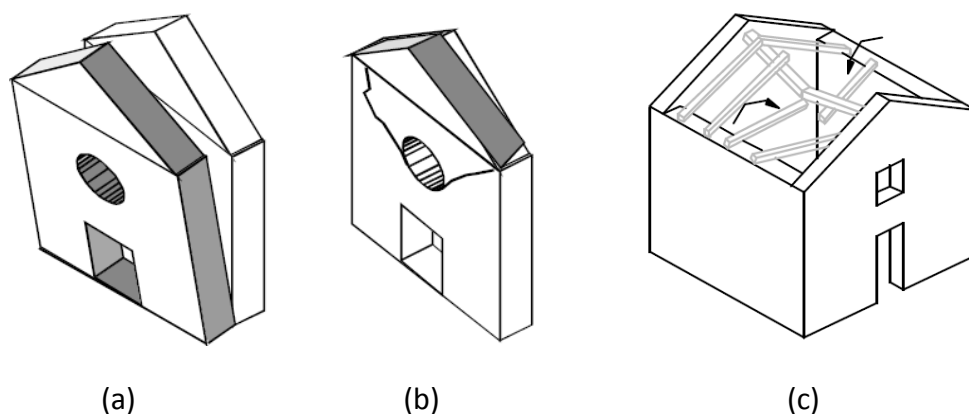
Typical out-of-plane failure modes of historical buildings; (a) façade overturning; (b) partial façade overturning and (c) collapse of the roof [D'Ayala, 2000]
